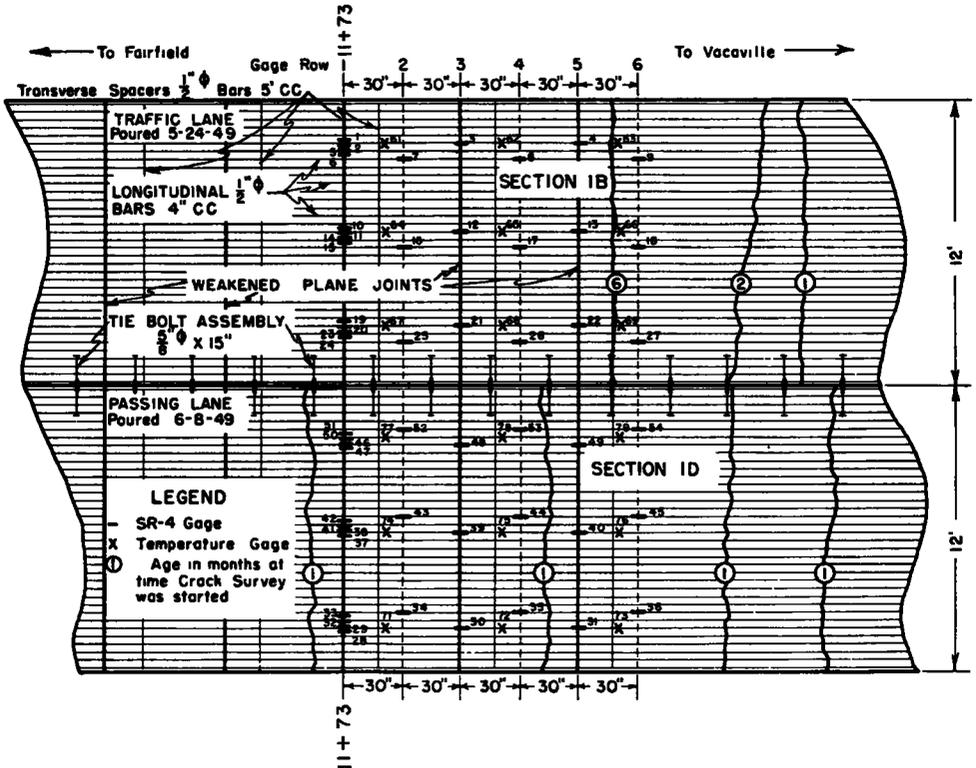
Plan of Placement of SR-4 Gages on Steel and Crack Formation—Sections 1-B and 1-D
